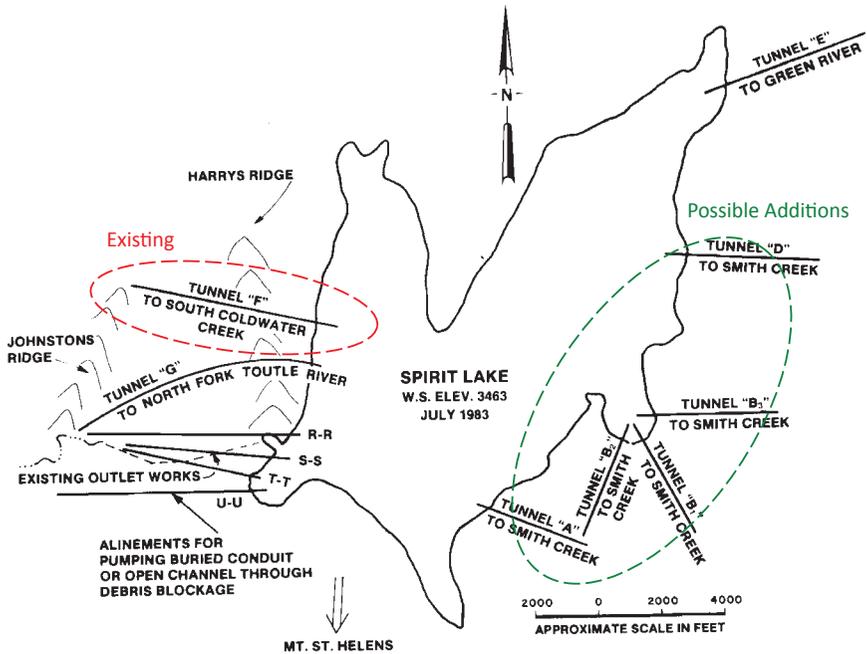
Original suggested tunnel alignments. Existing tunnel alignment (circled in red) drains Spirit Lake to the west, through Harry's Ridge toward South Coldwater Creek. Possible tunnels might drain to the east, toward Smith Creek. SOURCE: Modified from USACE, 1983.
